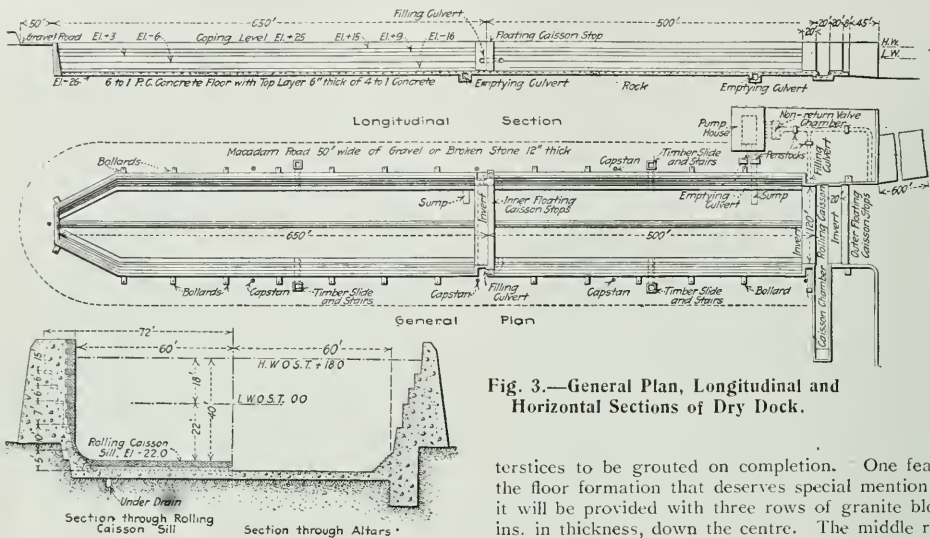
General Plan, Longitudinal and Horizontal Sections of Dry Dock.
